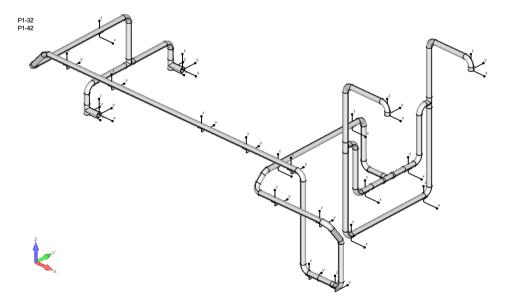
FEM model of pipeline with marked method of support and welds [5]
